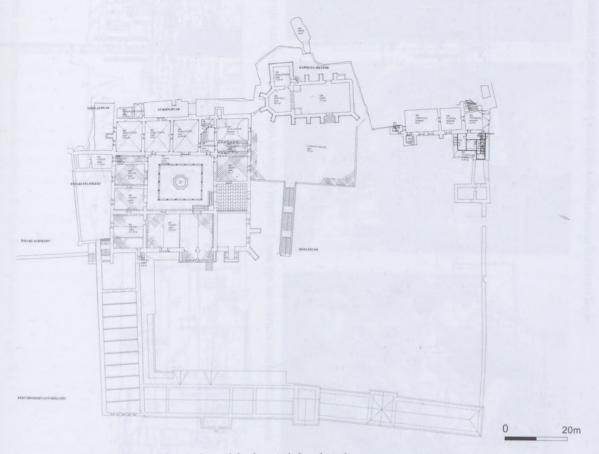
The ground plan of the loggia's level in the reconstruction program plan
